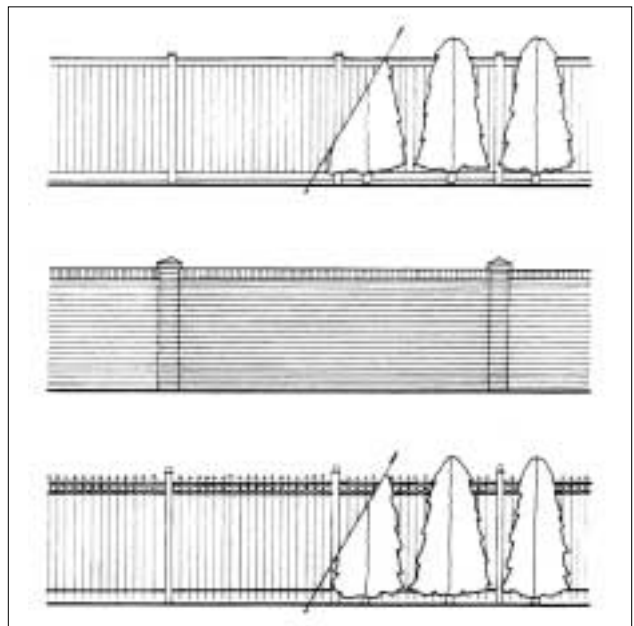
Examples of preferred screening walls and fences for loading docks, storage yards, trash enclosures and mechanical equipment include solid board fence, brick wall and steel picket fence.
